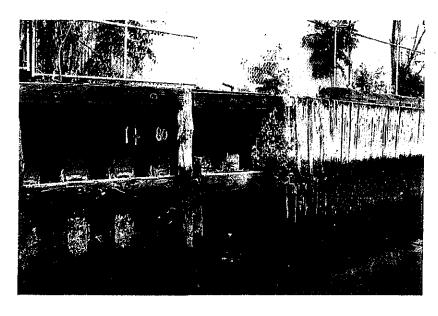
STA 1+80 NORTH END OF STEEL SHEETING
